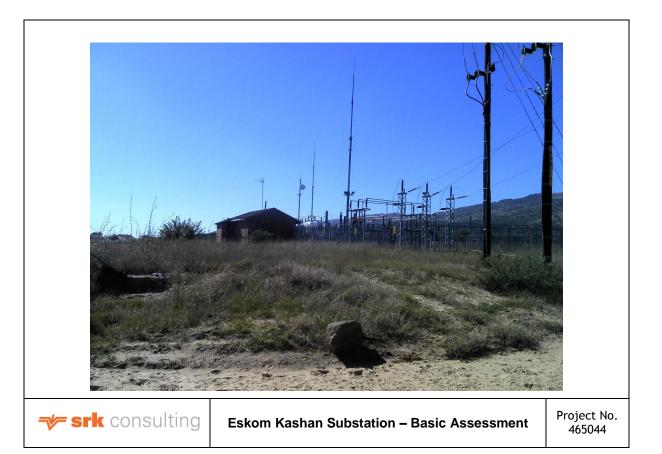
The existing Hekpoort substation to which the proposed substation and associated power line will be connected to.
